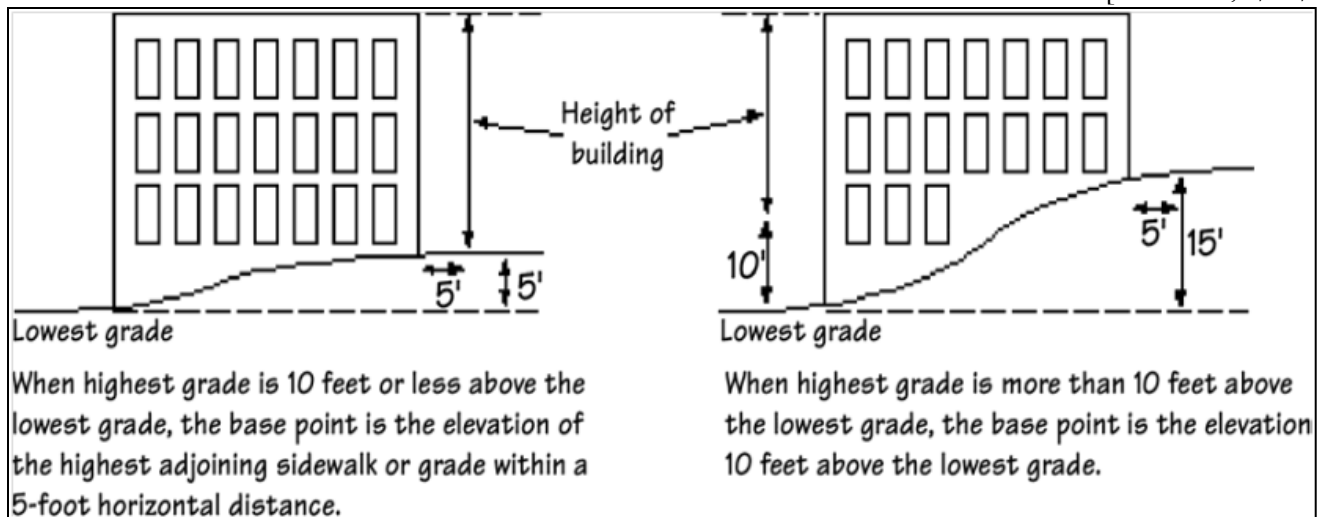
Measuring the height of buildings that have a portion below grade.
